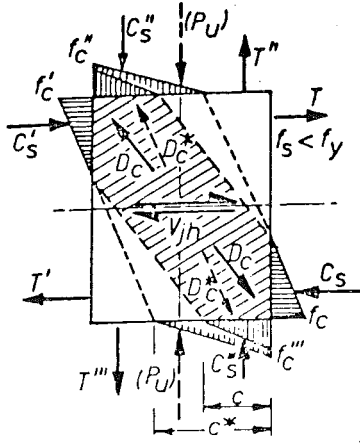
INTERNAL FORCES AT AN ELASTIC JOINT
